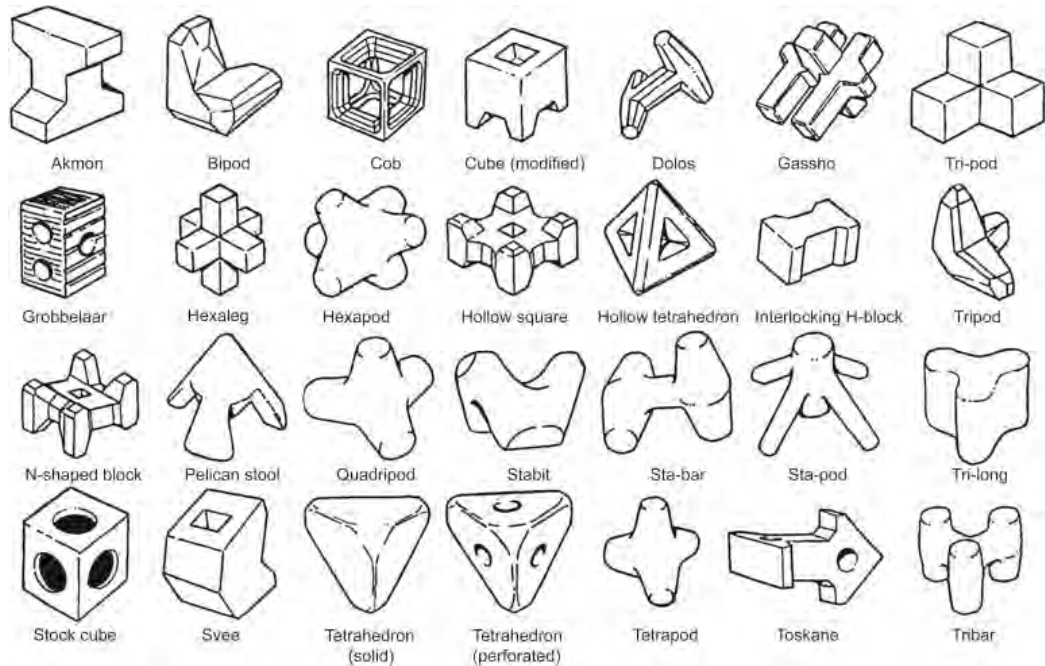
Assortment of common shapes for concrete armor units used in shore protection projects
